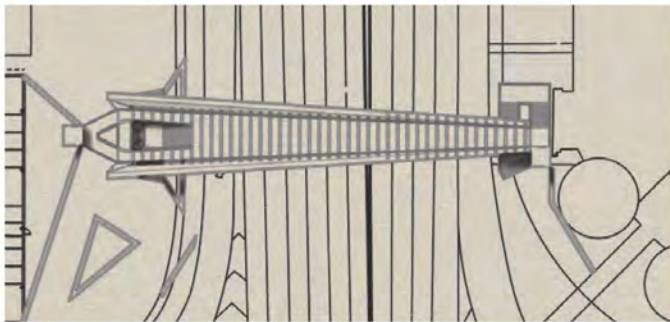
Plan view of Concept 4, the tilted steel girder option.
